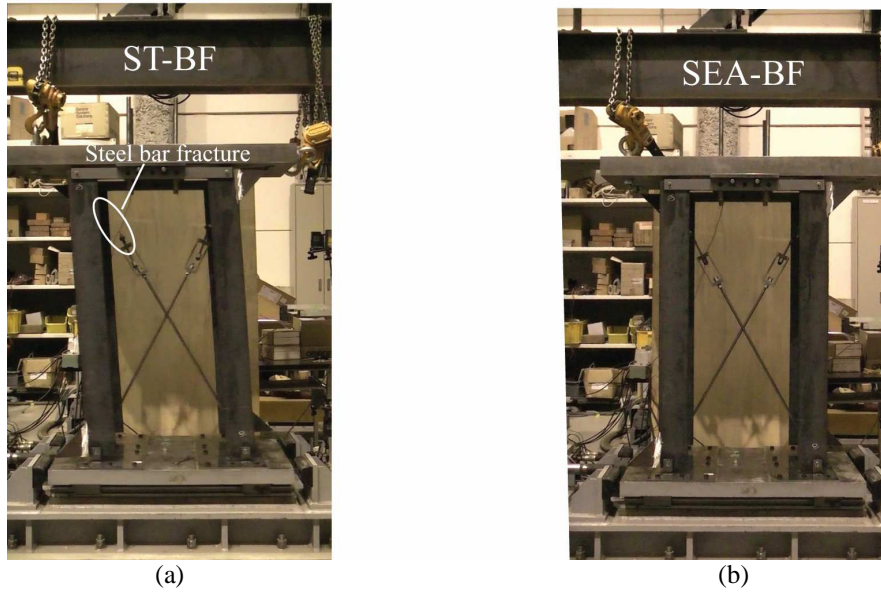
Deformed shapes at the end of RUN6: (a) ST-BF specimen, (b) SEA-BF specimen
